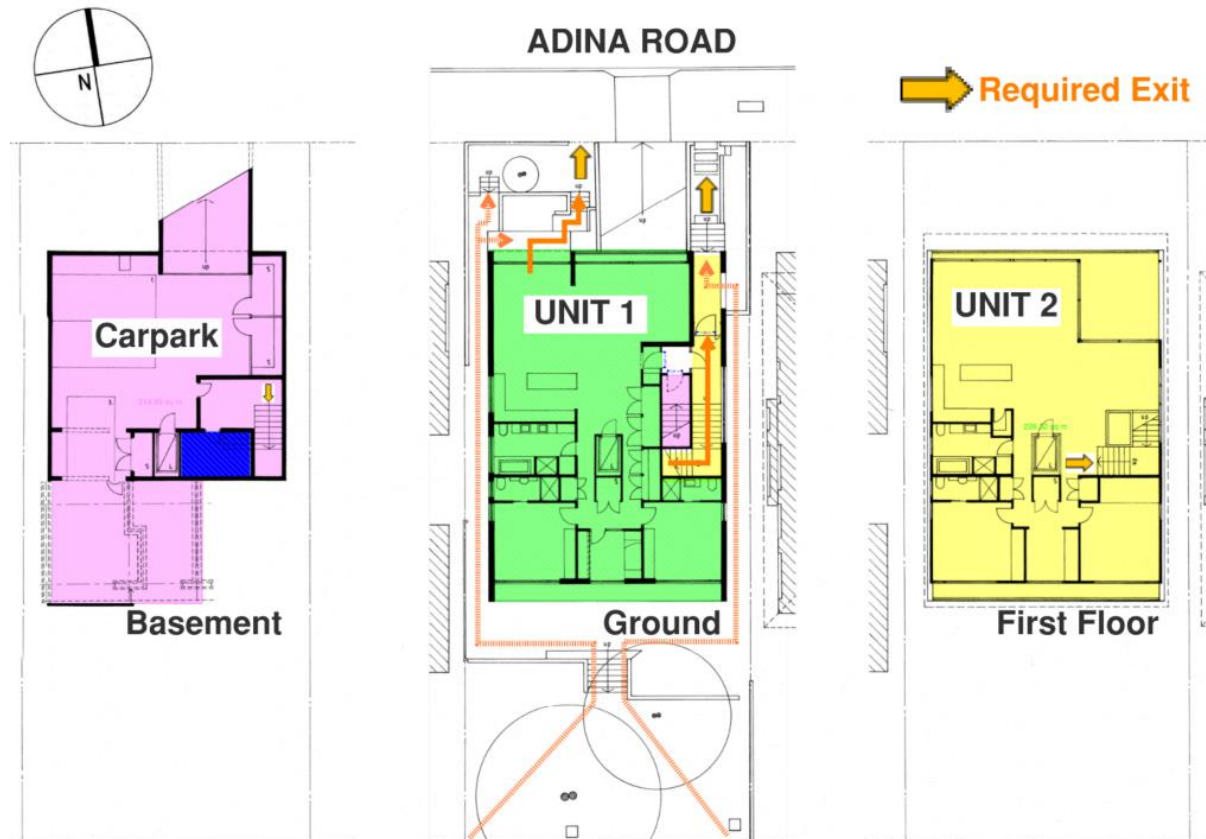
| Floor Plans of the proposed development | Source: Garcia Negrette Architecture & Design
